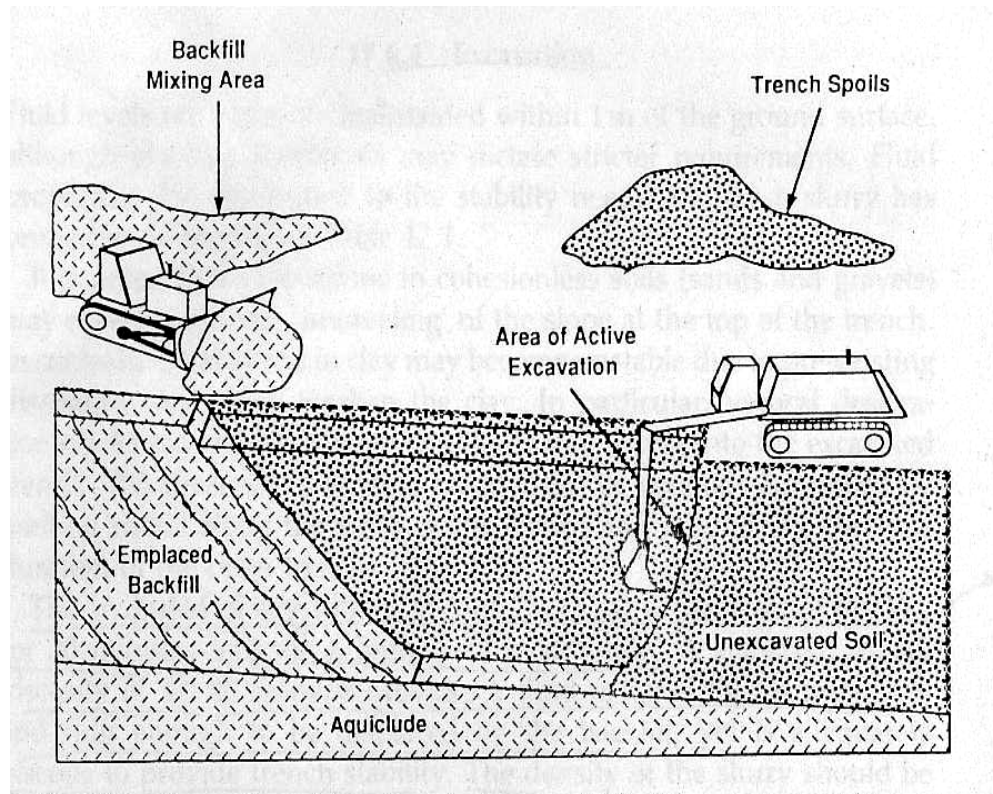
Excavation of trench and Placement of Soil-Bentonite Backfill (after Evans, 1993)
